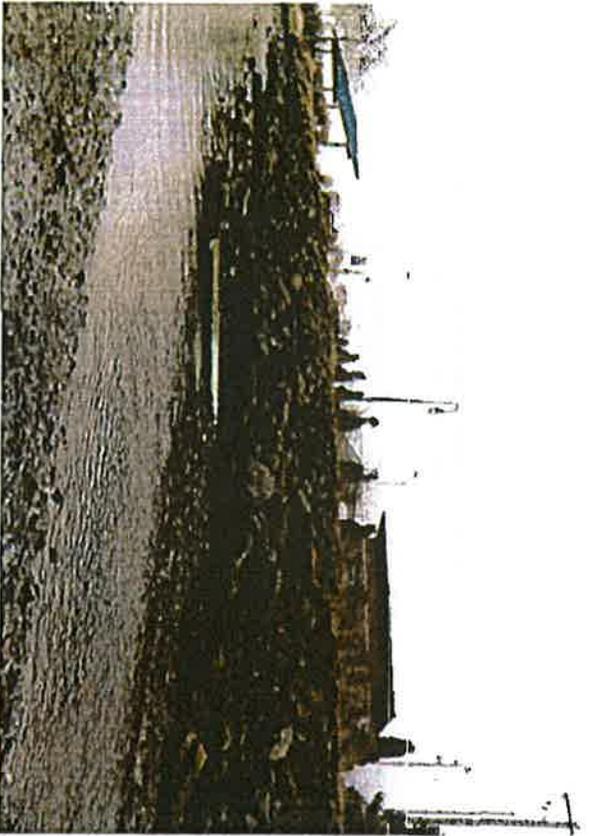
Existing storm drain outfall to Valley Creek Estuary to be removed. Tide is at 5ft elevation, relative to MLLW, February 11, 2014.
